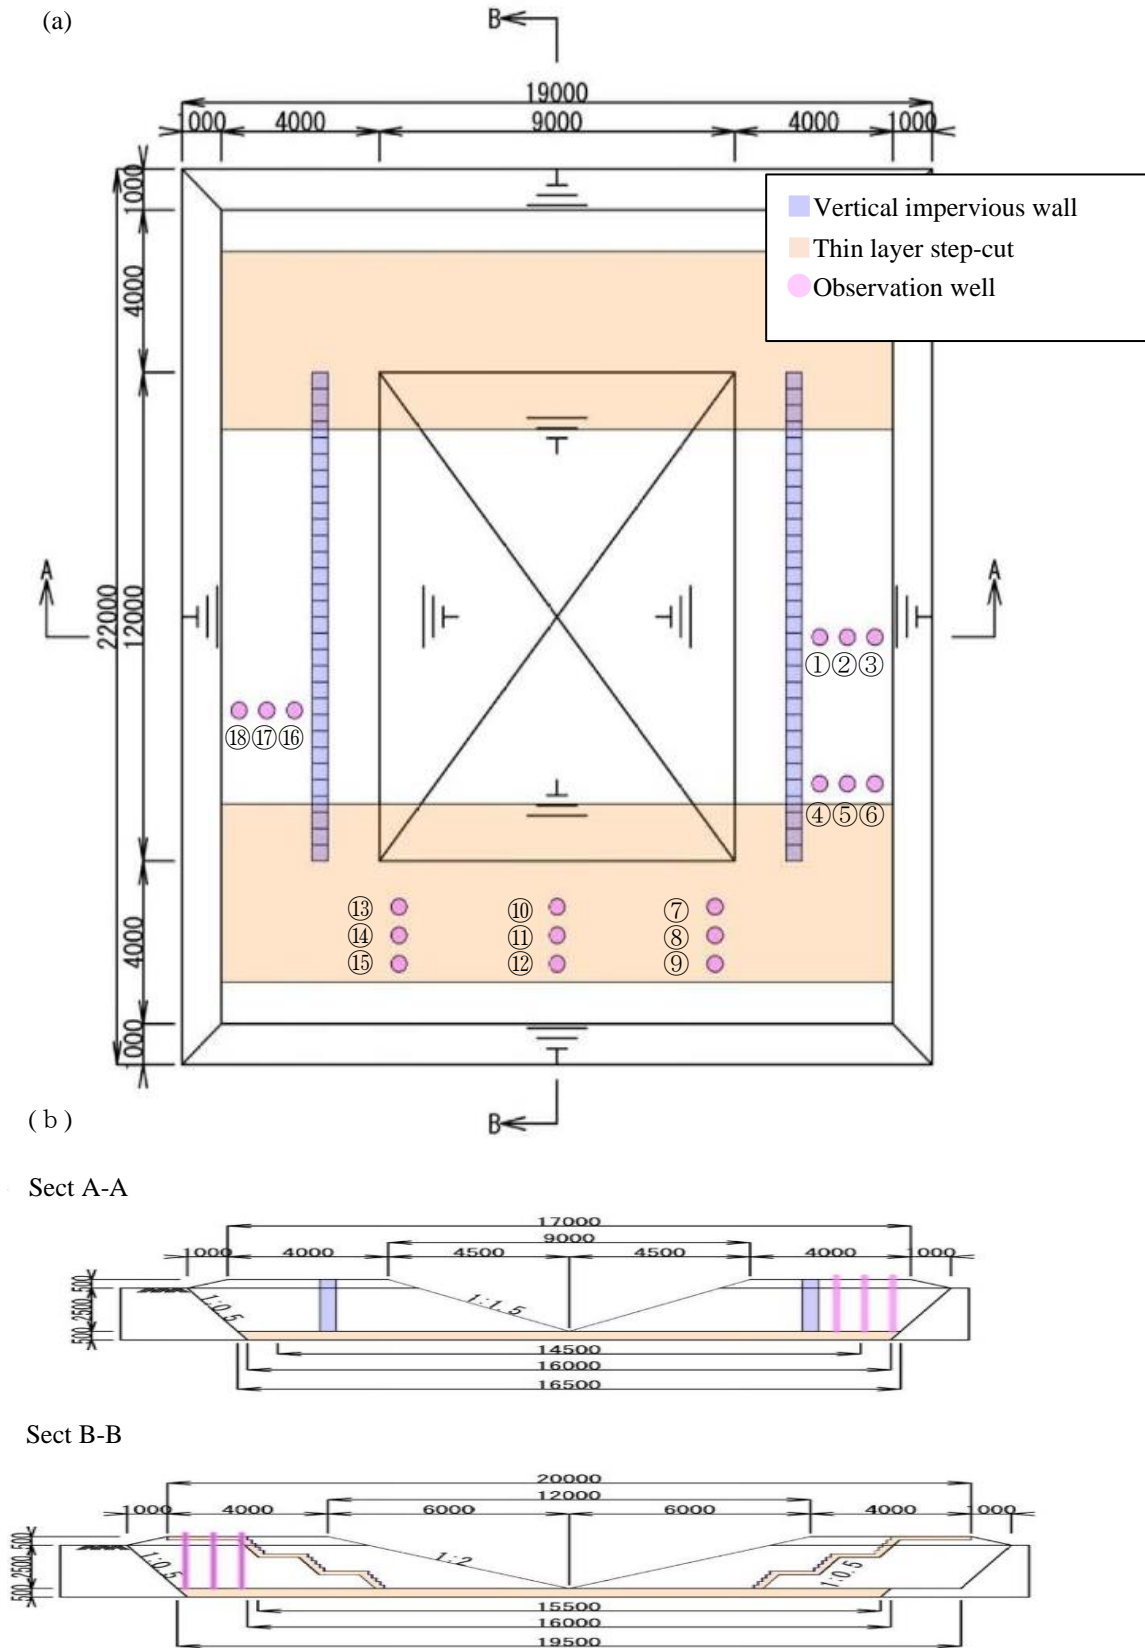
Schematic diagram of a full-scale model reservoir (a) Plan view, (b) Cross-sectional view of thin layer step cut method, and (c) Cross-sectional view of vertical impervious wall method
